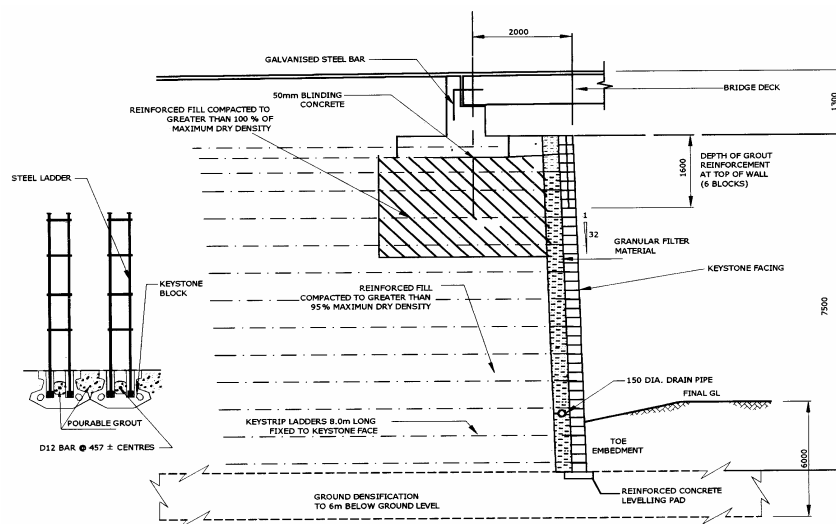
Tahuna Bridge Steel Ladder Reinforced Abutment with KeyStone Facing
